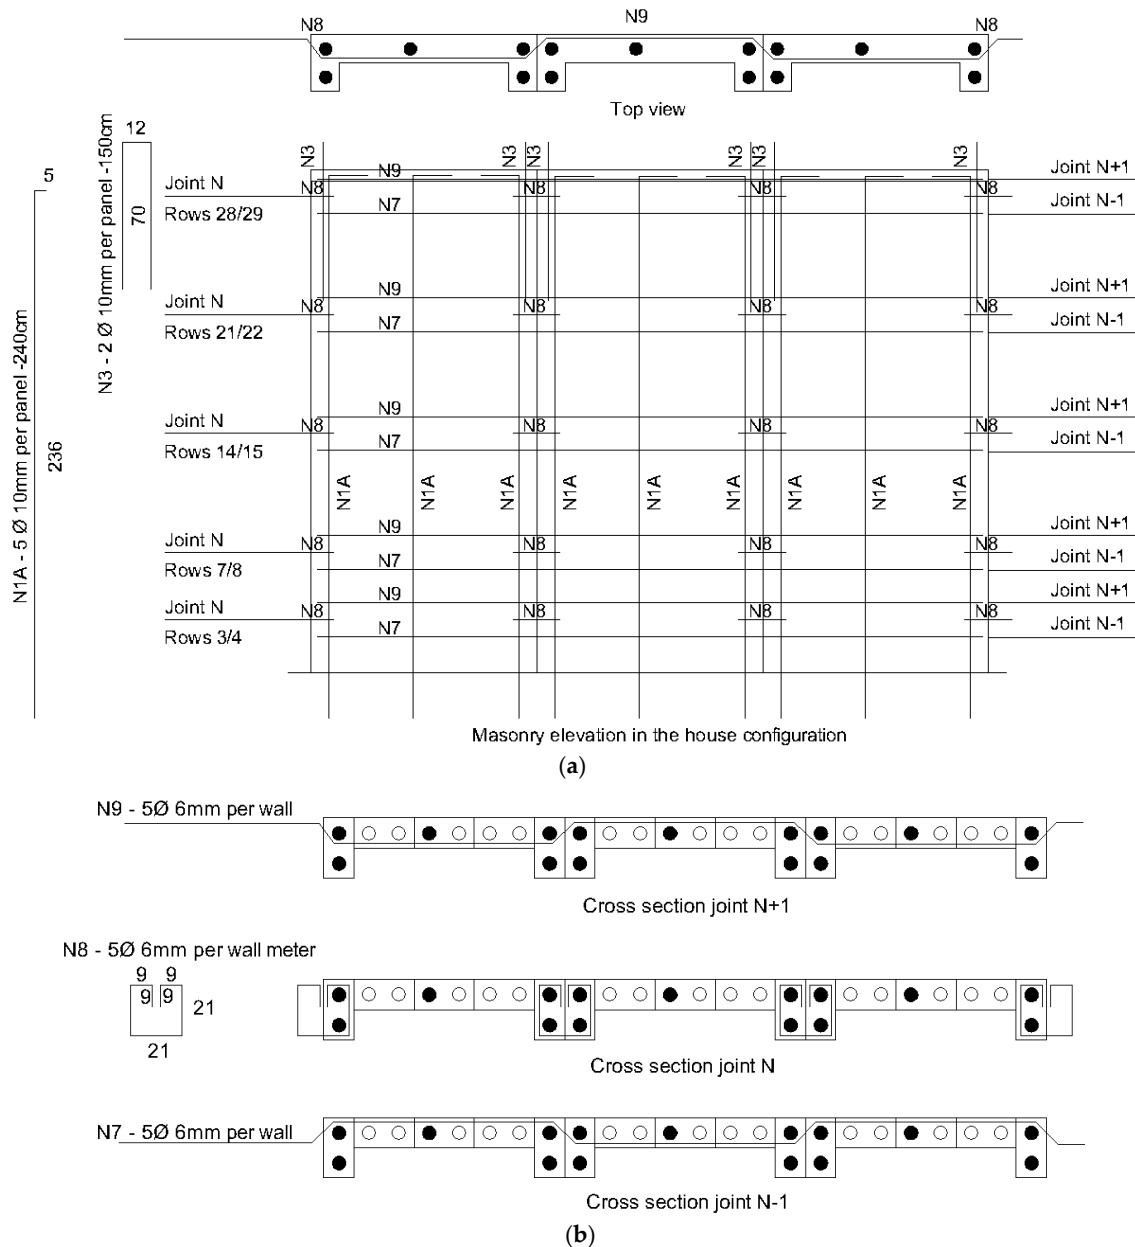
Reinforced CEB masonry in the house configuration: (a) vertical reinforcement; (b) horizontal reinforcement.
